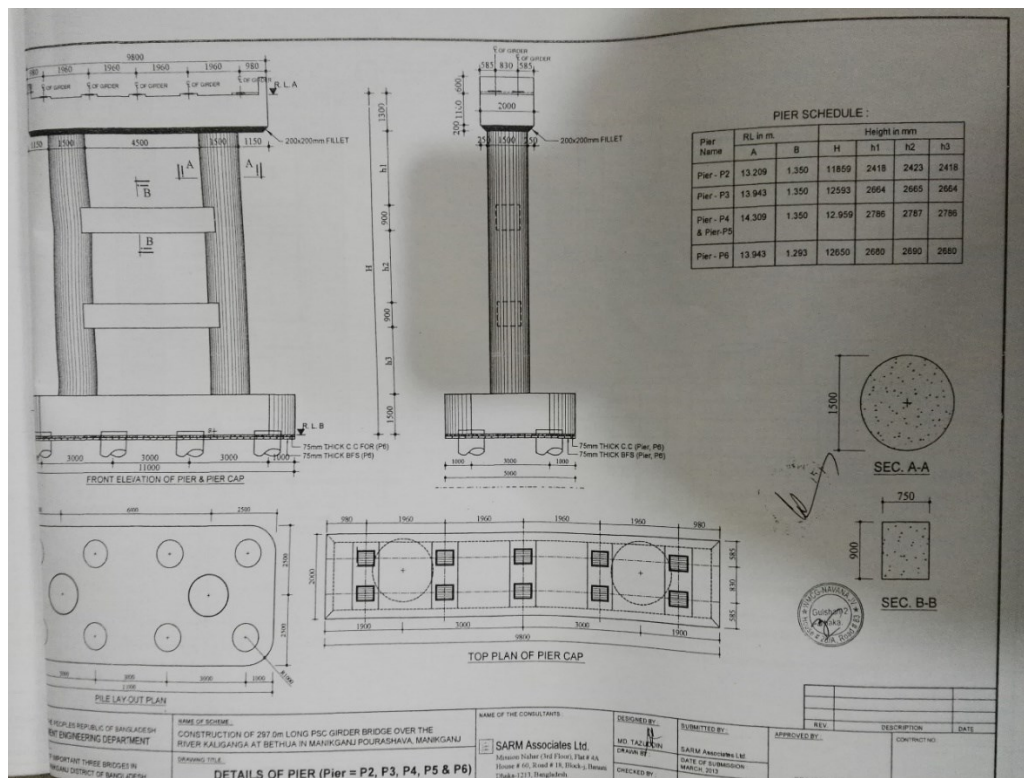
Structural Drawing (Piers 2, 3, 4, 5 and 6)
